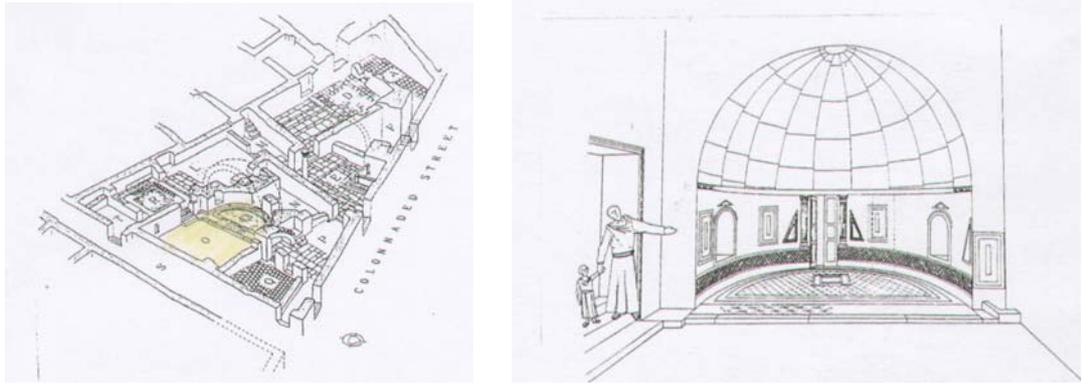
Reconstruction drawings of the apsidal hall in the Twelve Room House, Sardis
